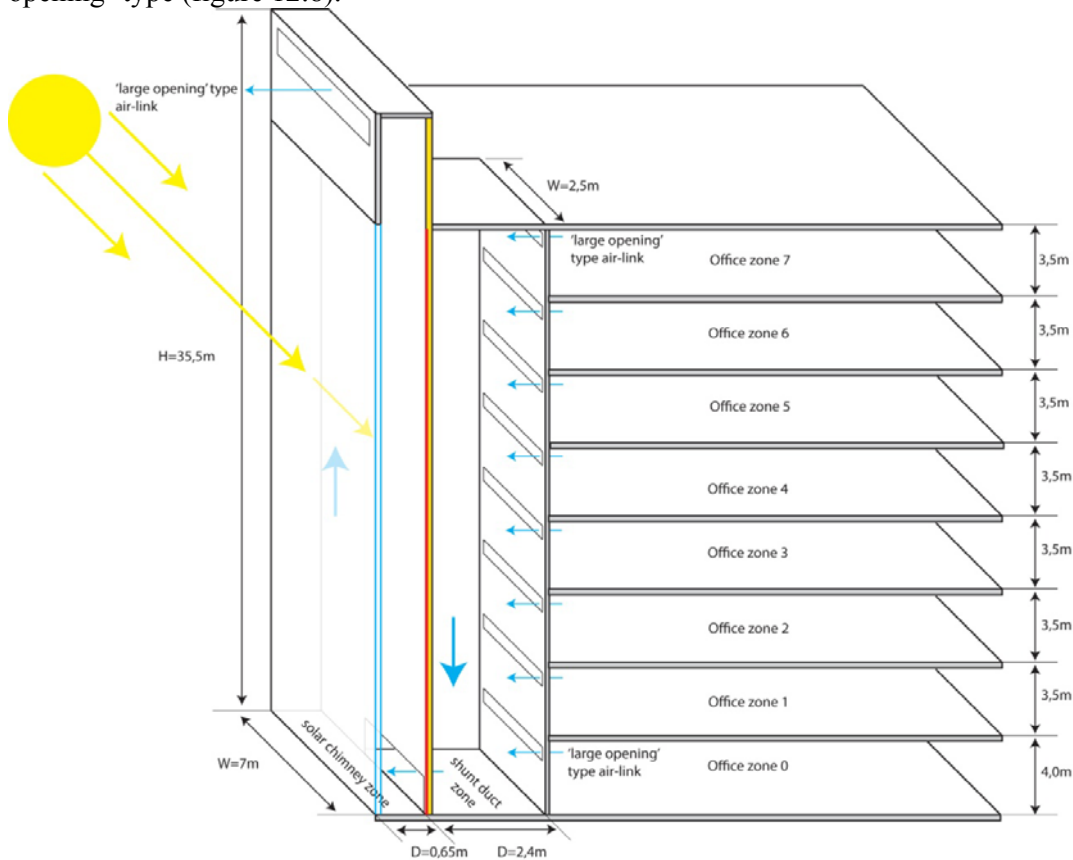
solar chimney and shunt duct in [case-1A] modeled as building zones interconnected by ‘large opening’ type air-links.
